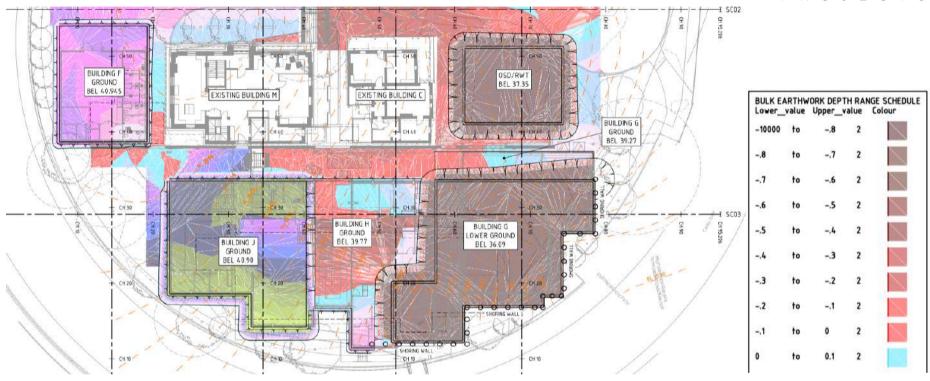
Bulk Excavation Works- Cut and Fill Plan Excerpt. Water Tank excavation area indicated as 'OSD/RTW', Building G excavation area visible in southeast (Source: Bonacci Group, DWGC010, 19.12.19)
